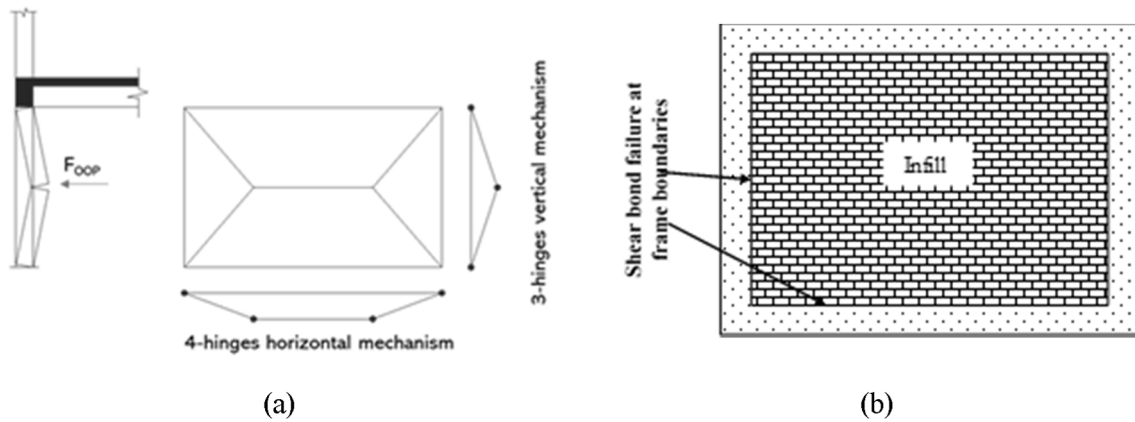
Out-of-plane failure mechanism of infill walls: (a) flexural and (b) shear failure.
